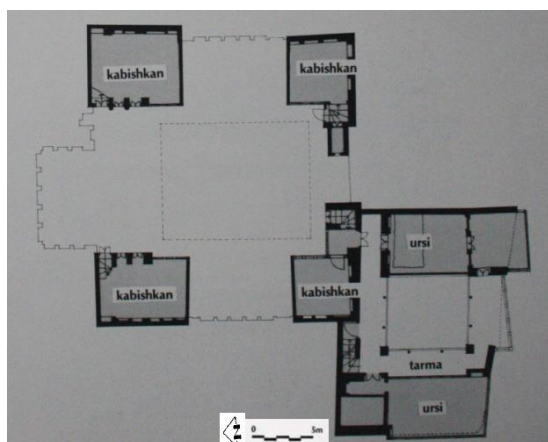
House 47 (Second Floor, Second Mezzanine) (Warren & Fethi 1982)
